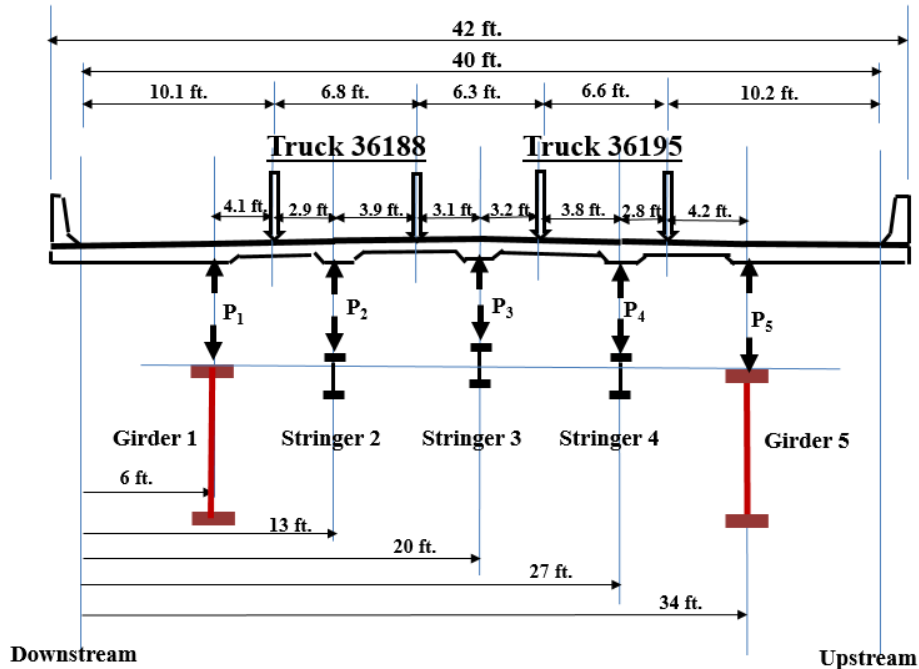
Cross-sectional elevation view of two trucks at mid-Span 3
